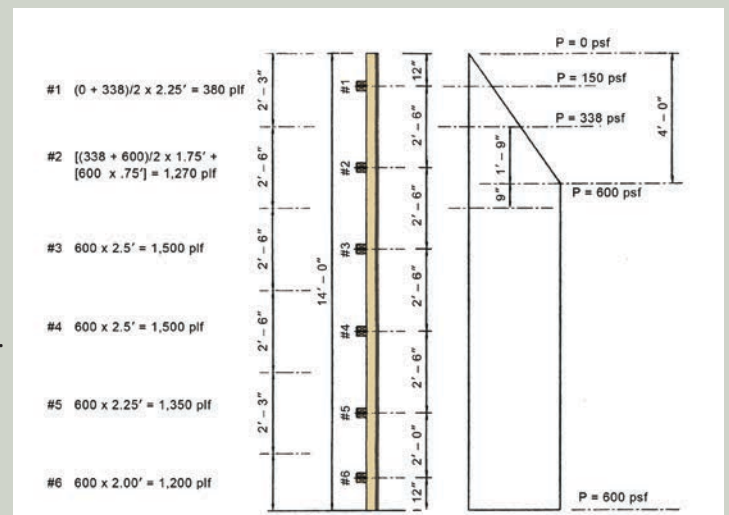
Fig. D: Spacing of wall form wales and tributary loads at each wale level
